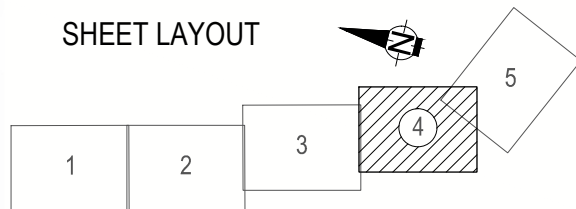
DRAINAGE INVENTORY 1/5.000
